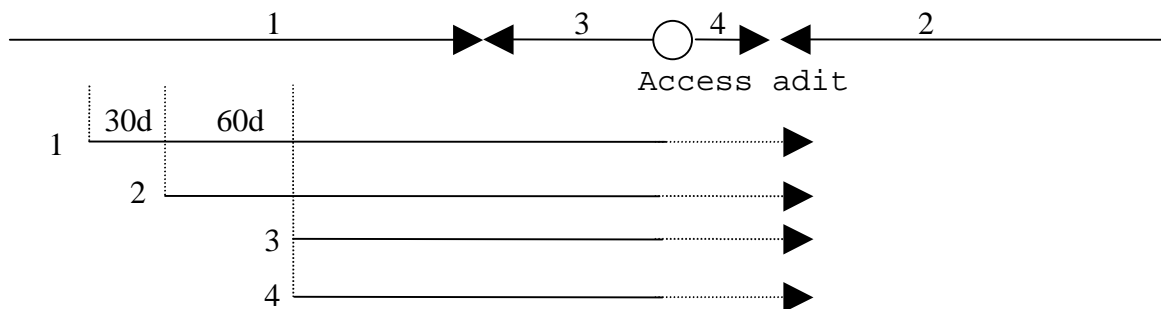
Geometry of excavation face and scheduling of tunnels excavations sequence
